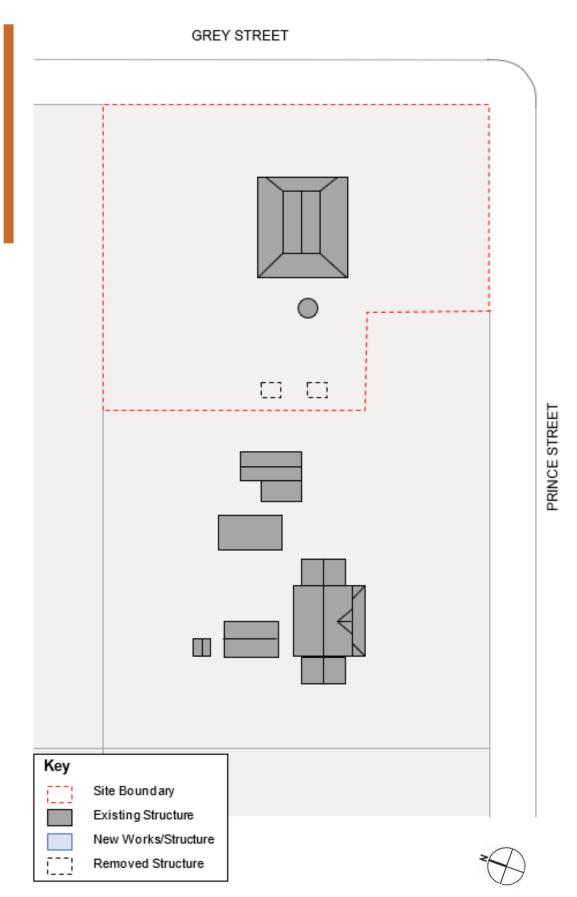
Clarence Town Courthouse and site period of construction - 1990. Note: The Clarence Town Courthouse and Police Residence site was subdivided to form two lots.
